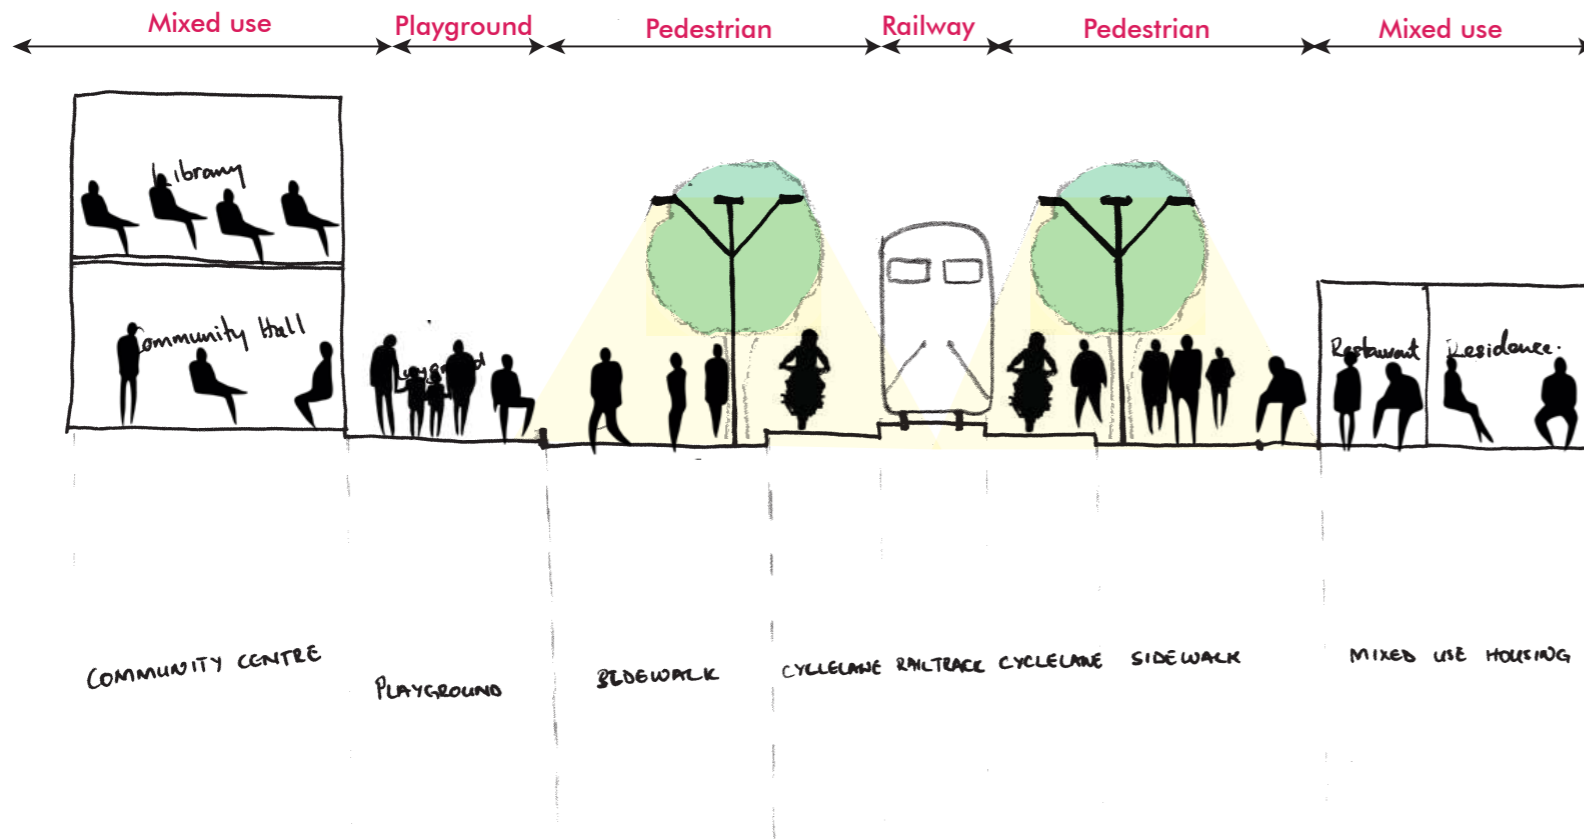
Sections of the existing and proposed conditions of the community centre
